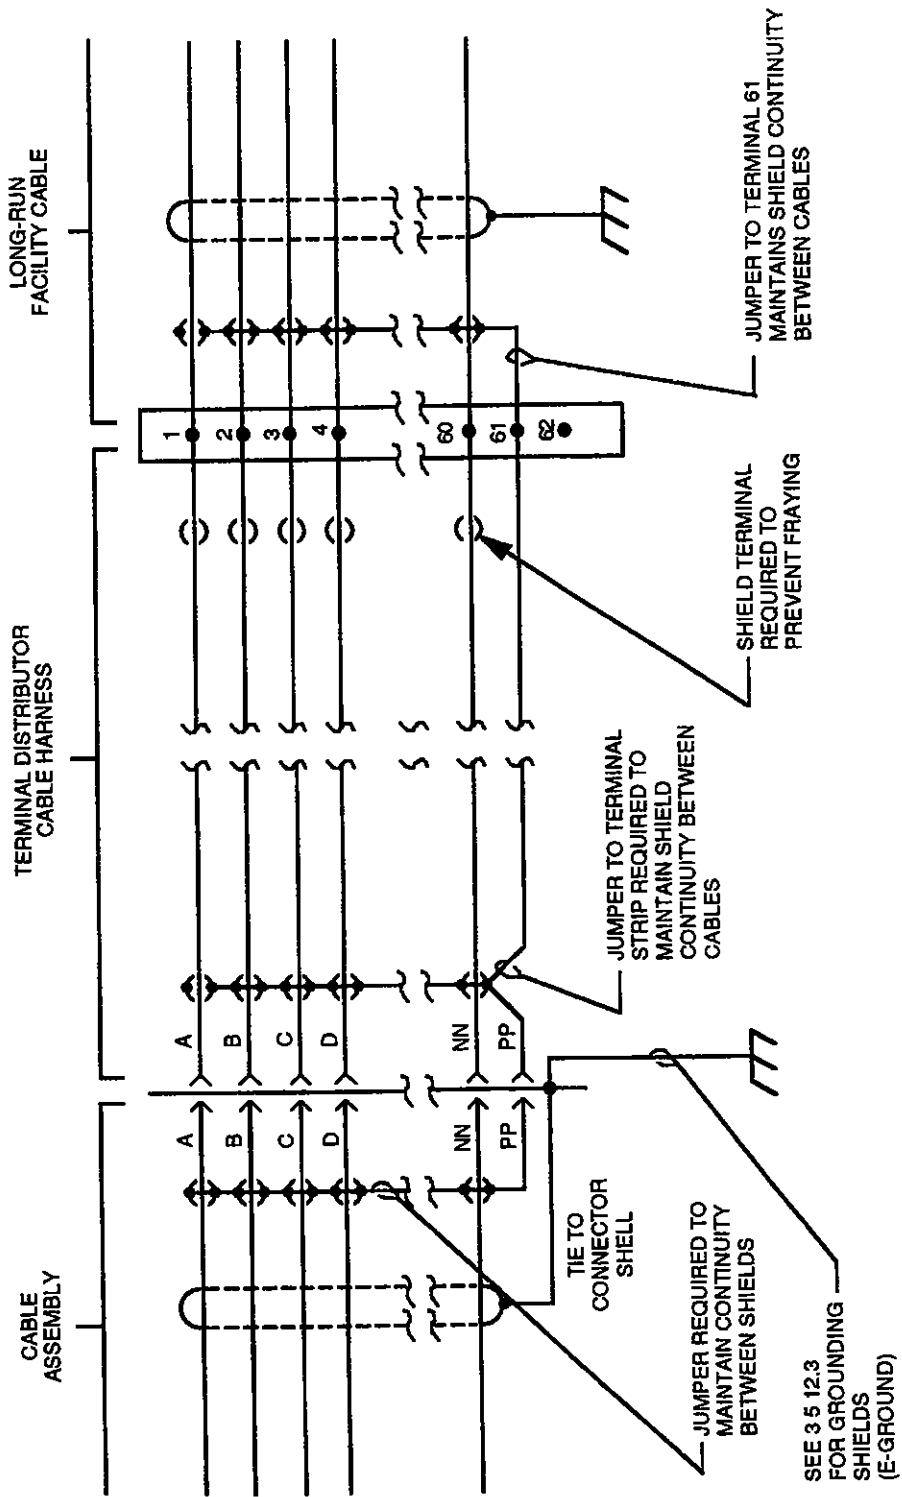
Typical Termination Configuration for Overall Shielded Cable With Uninsulated Conductor Shields (e.g., Using MIL-C-26482-Type Connectors)
